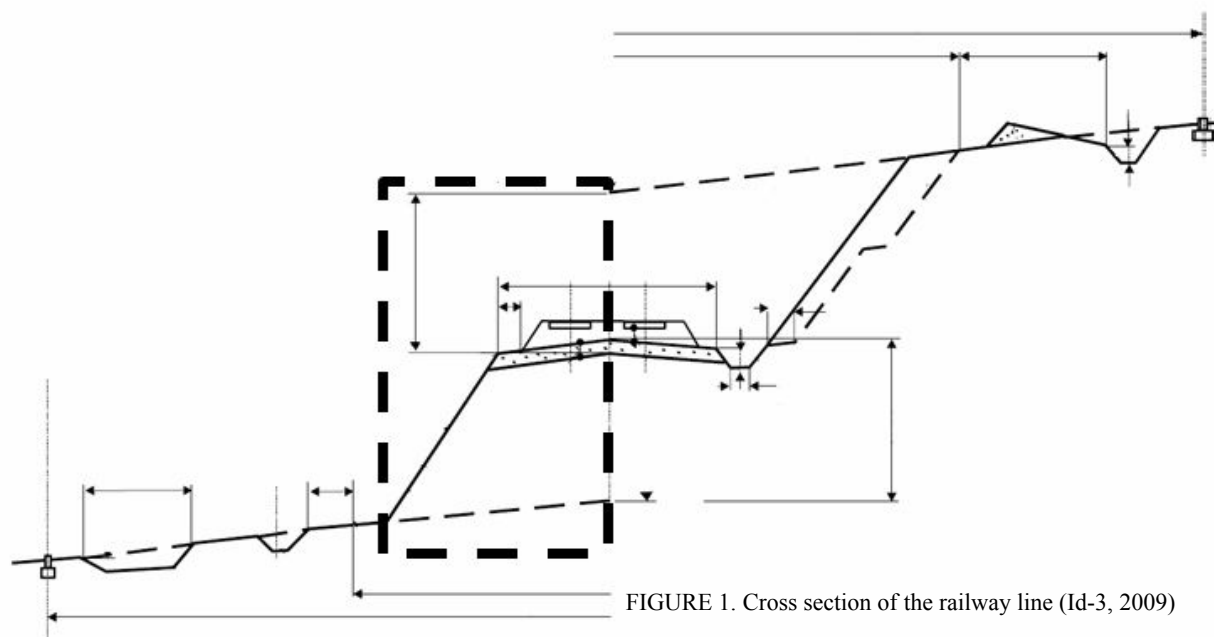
Cross section of the railway line (Id-3, 2009)
